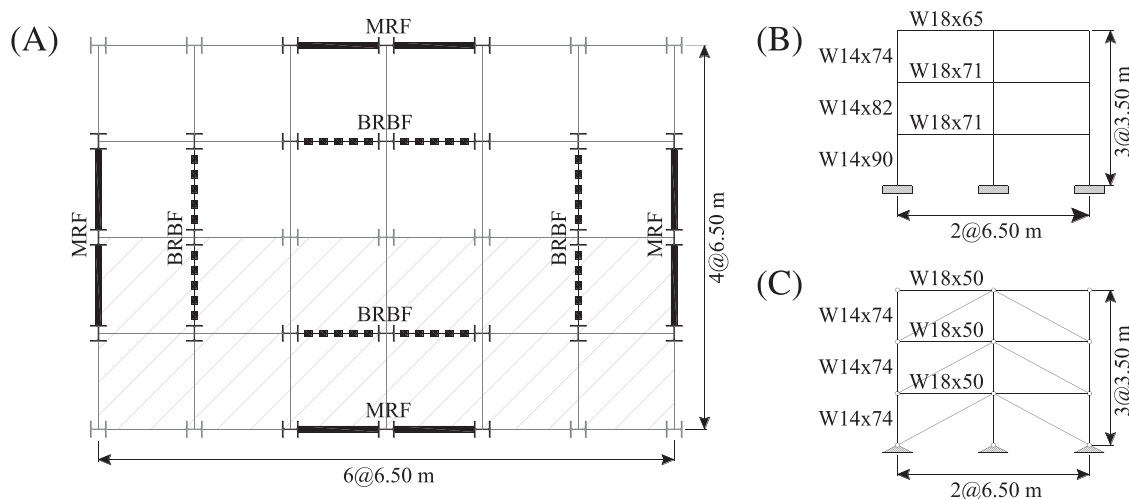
Newly designed dual steel MRF and BRBF. A, Plan view, B, elevation view of the MRFs, and C, elevation view of the BRBFs
